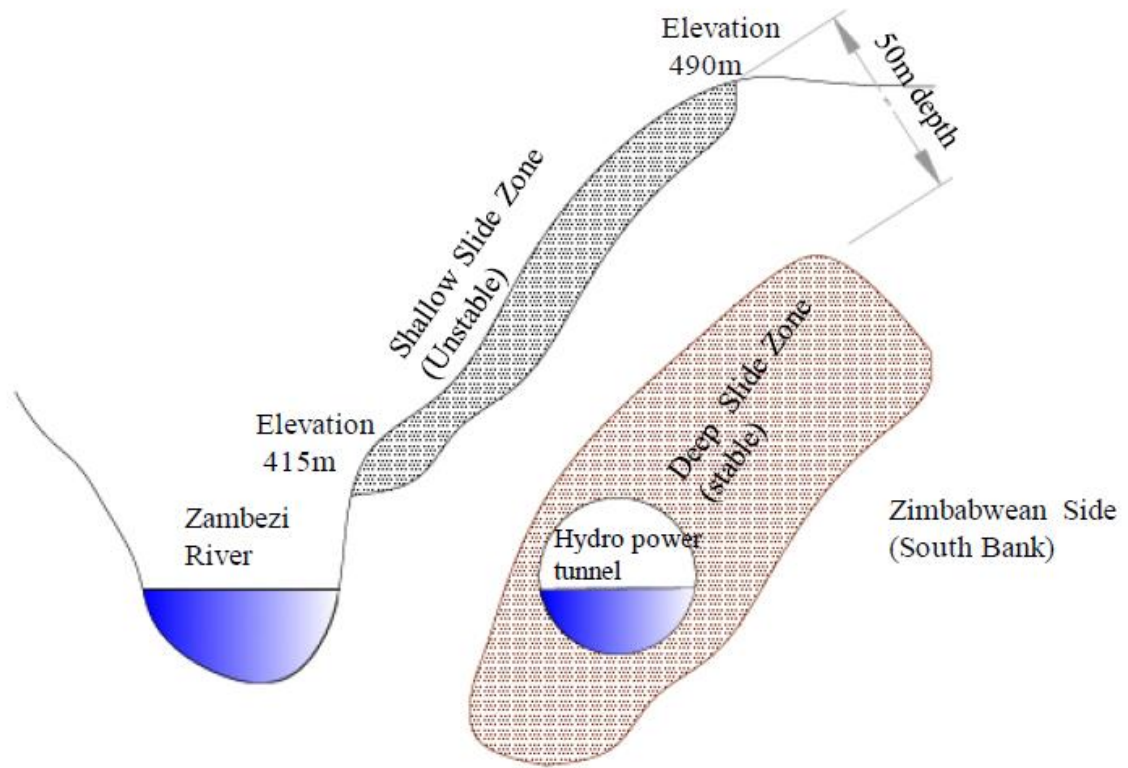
Cross-Sectional view of the Landslide zones of the South Bank (not to scale)
